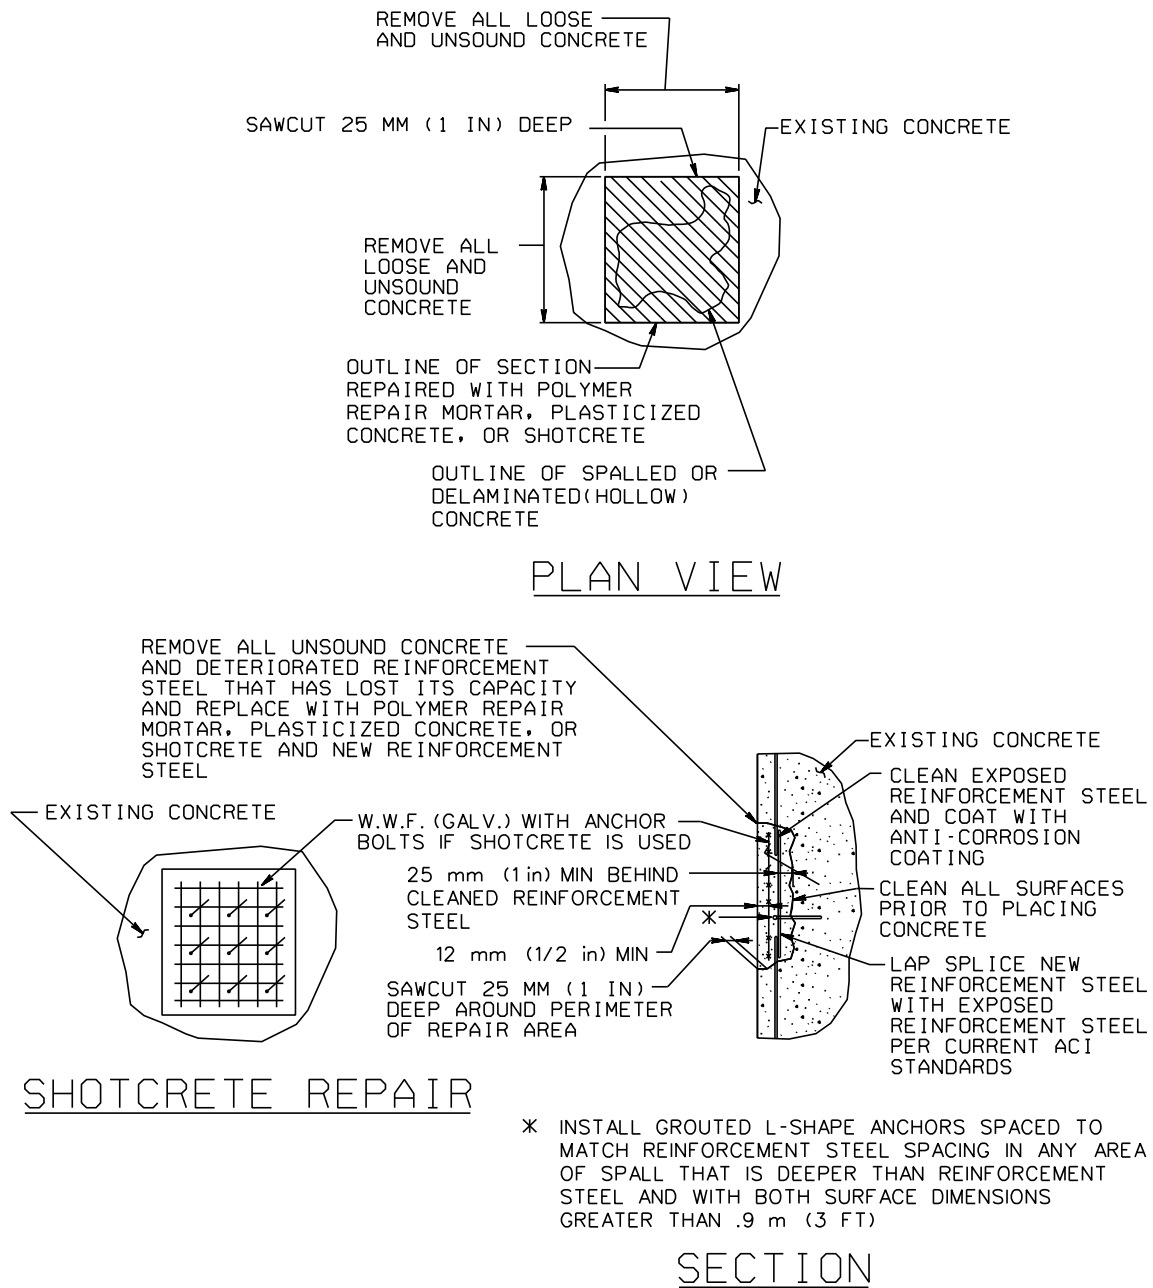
Deep Spall with Exposed Inadequate Reinforcement Steel (using polymer repair mortar, plasticized concrete or shotcrete) (FHWA, 2005)
